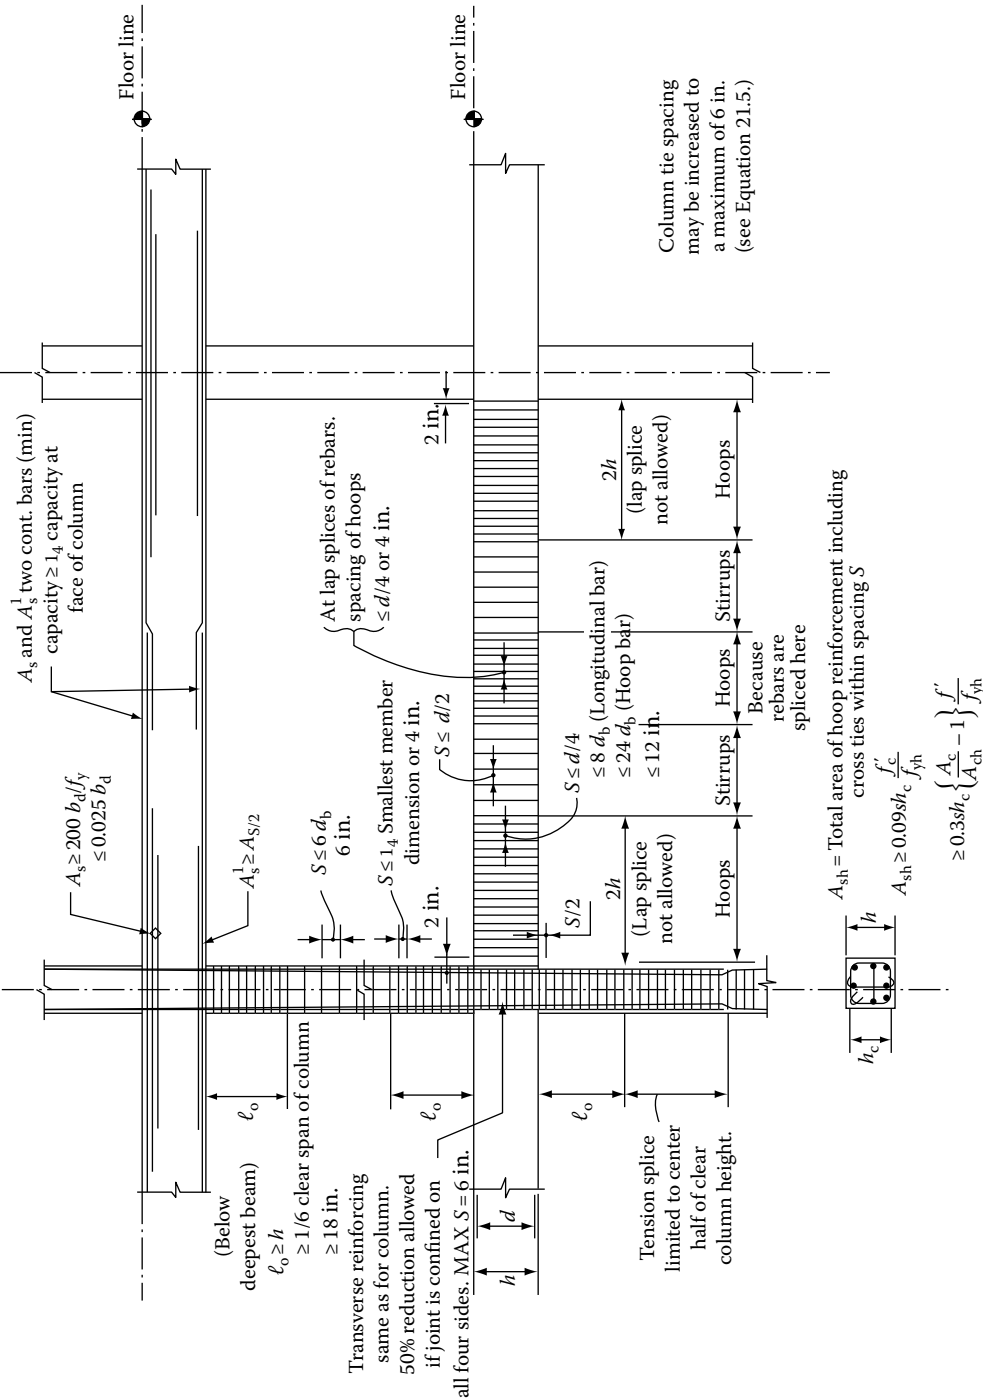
Ductile frame, SMRF: schematic reinforcement detail.
